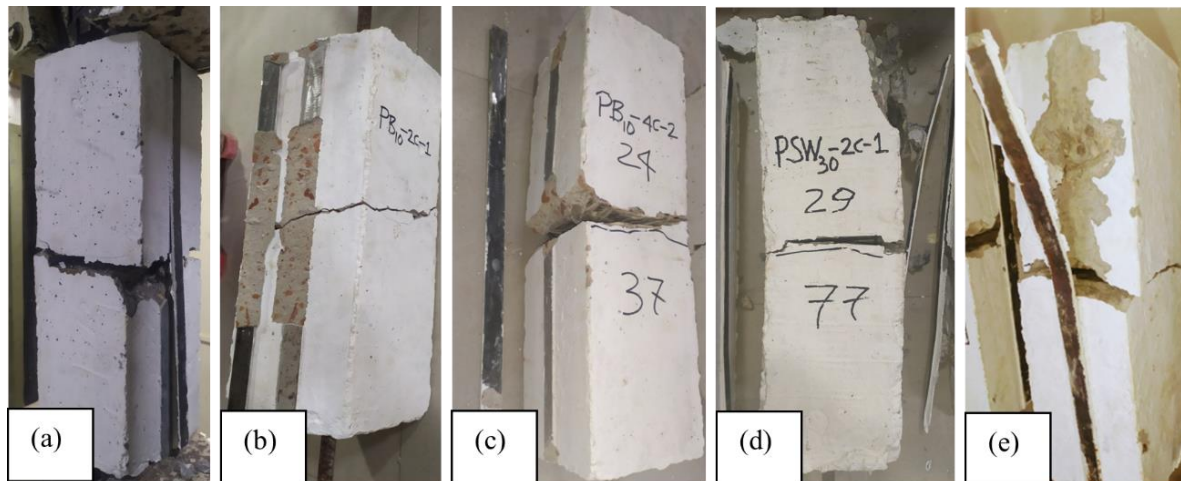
Failure modes of prisms: (a) without anchor; (b) embedded double connectors; (c) embedded multi connectors; (d) welded double connectors; (e) welded multi connectors.
